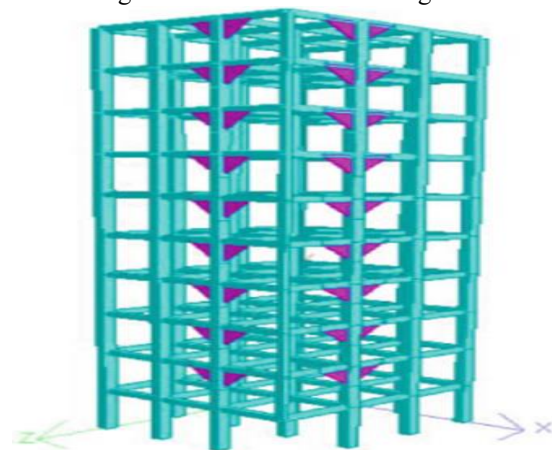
Building with a floating column at the ground floor's corner and a Triangular Plate. [3]
